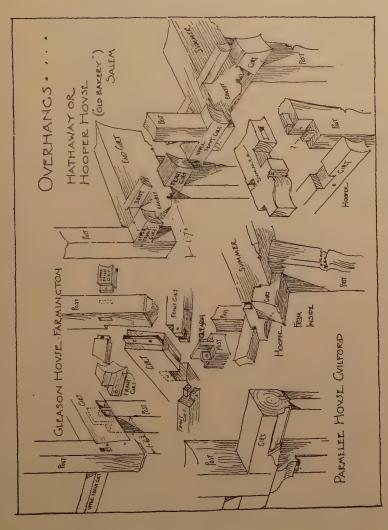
FRAMING DETAILS. THE OVERHANG
